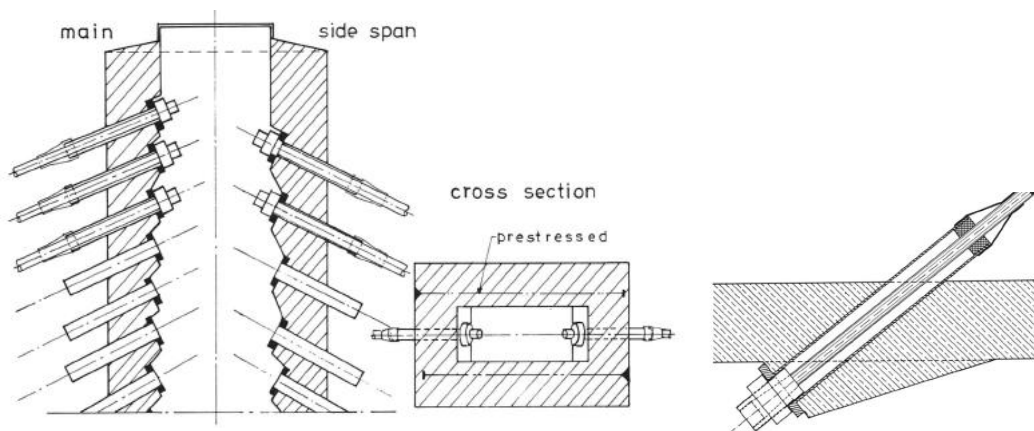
Anchorage of Cables to Concrete Pylon with Prestressing Tendons and to the Girder (Leonhardt & Zellner, 1980)
